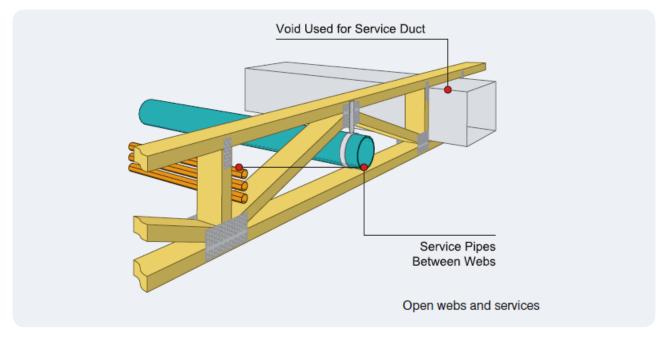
Framed floor systems accomodating building services within floor depth. (Image: Pryda)
